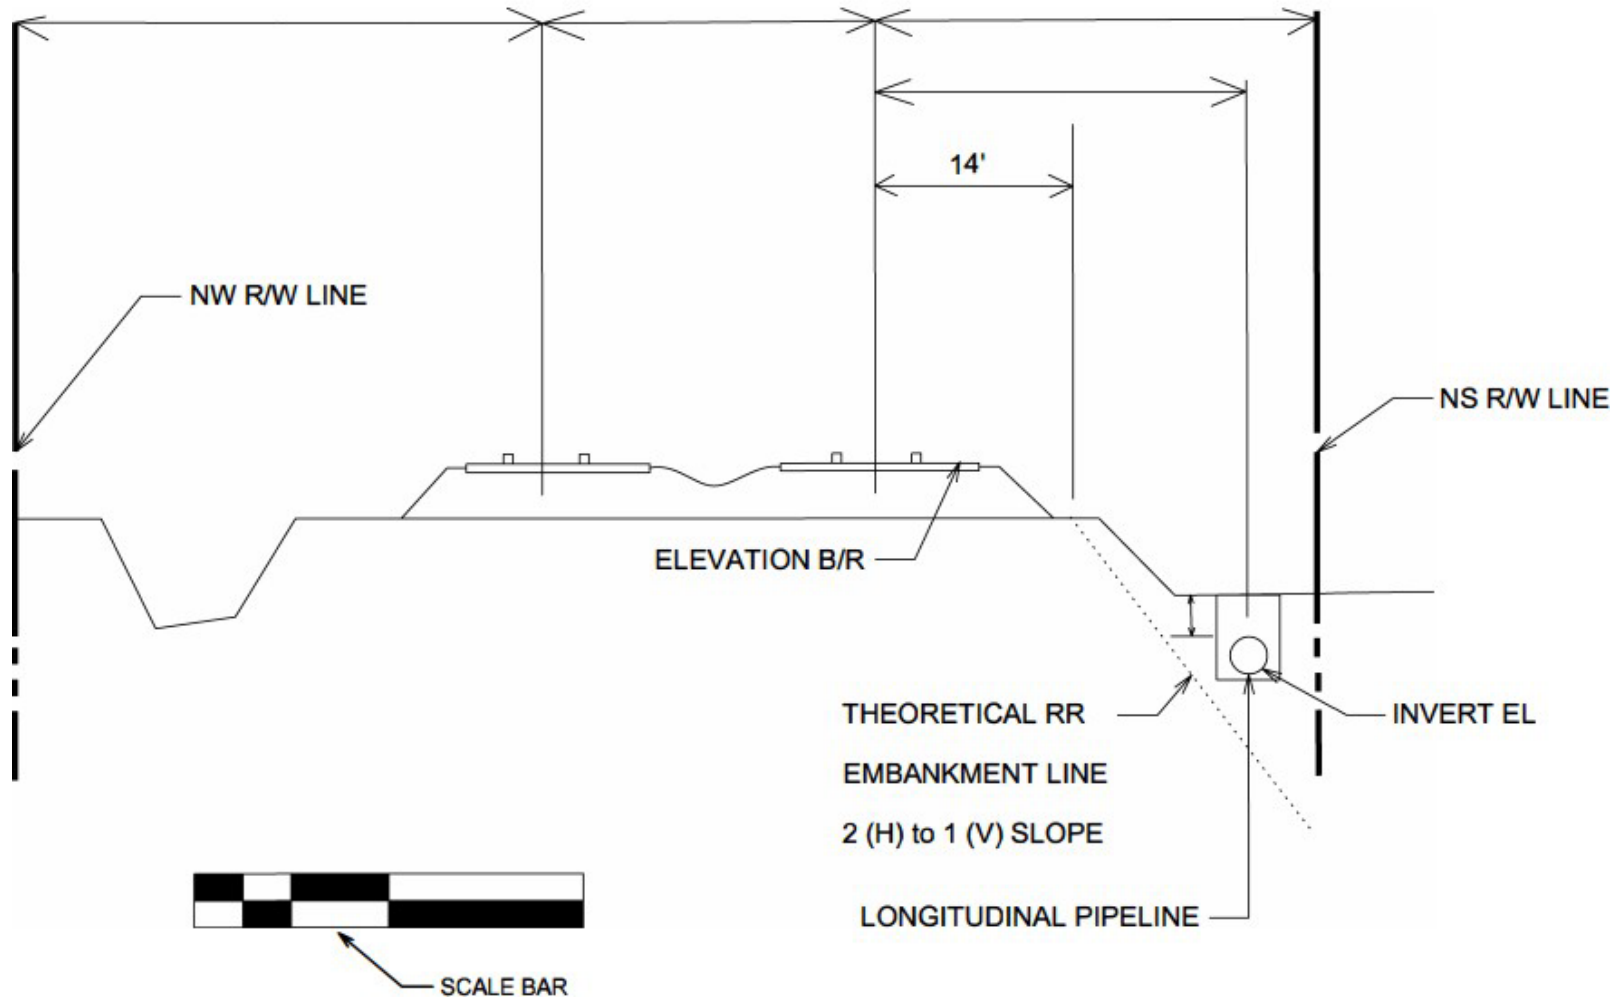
### Plate IV - Sample Pipe Parallel Plan and Profile Views
